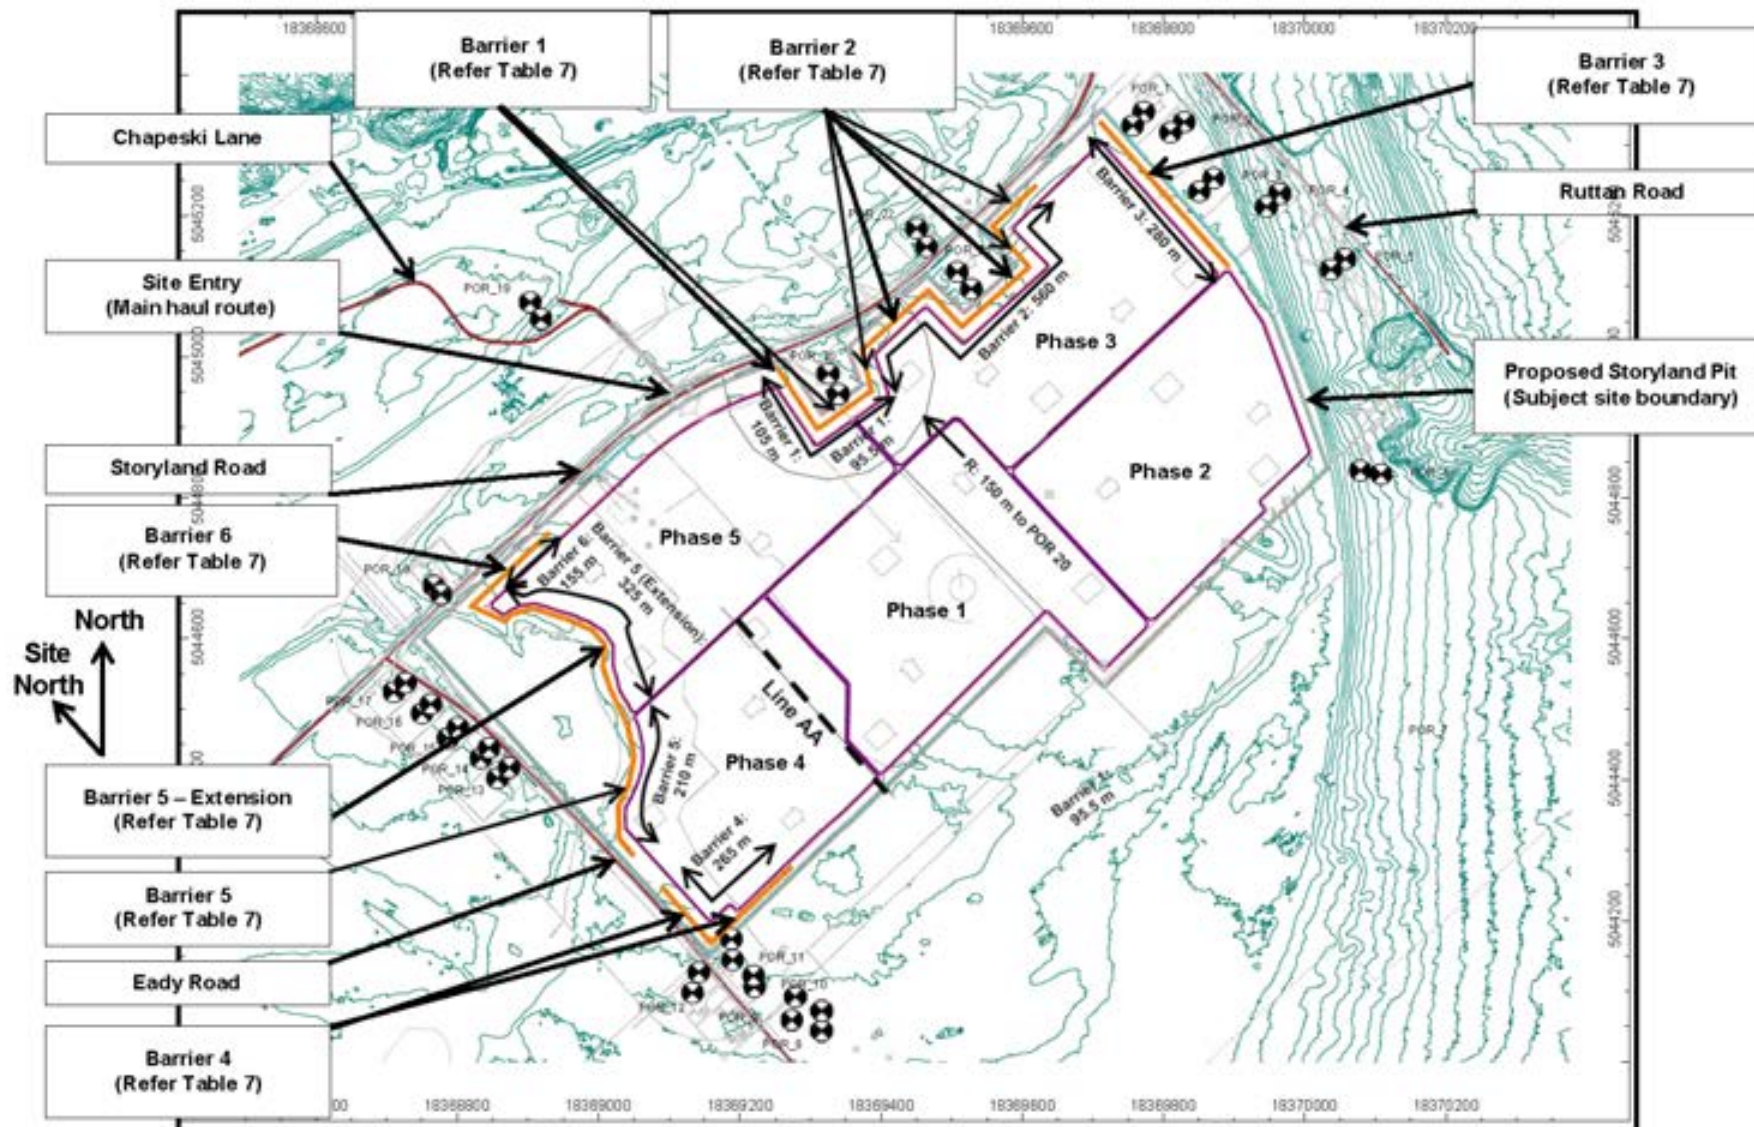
Detailed Plan at Wash Plant in Phase 1 showing Recommended Noise Barriers (Stockpiles)
